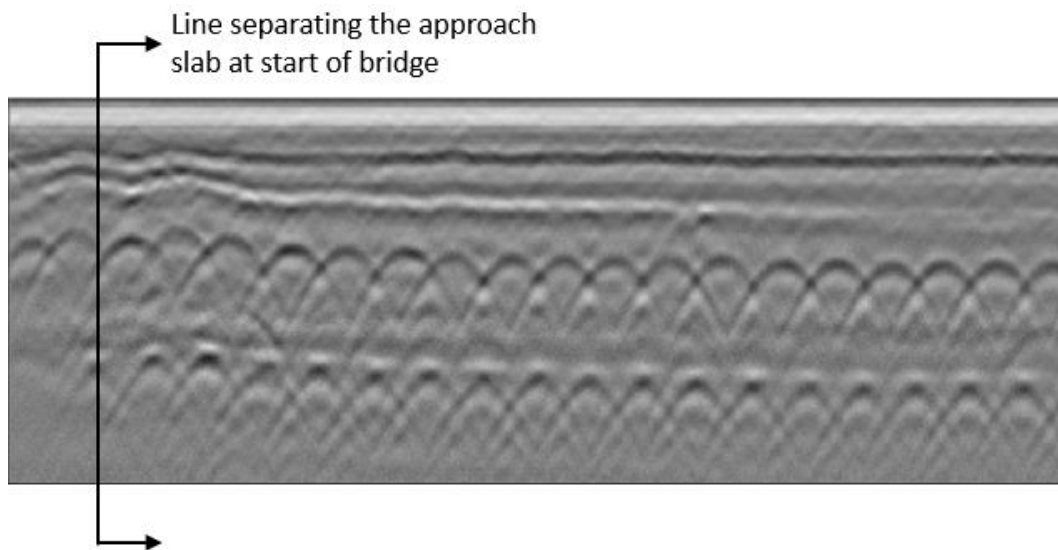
Line Separating the Approach Slab at Start of Bridge
